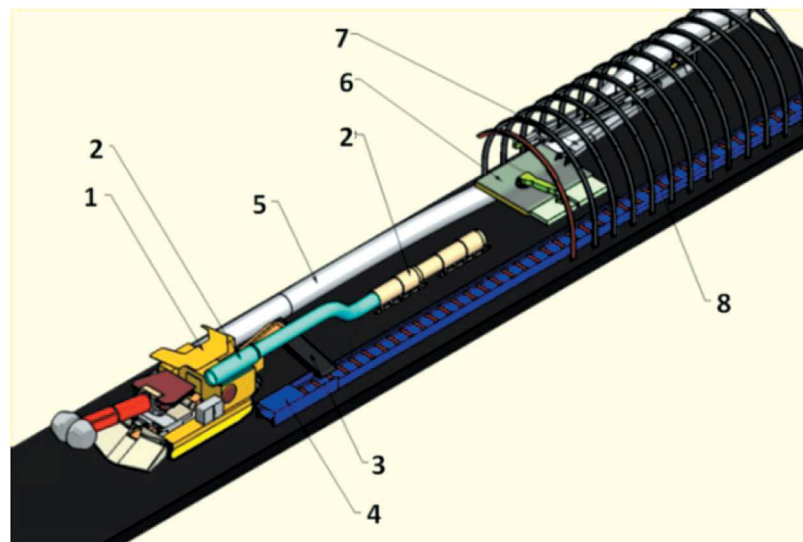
Model of collaboration of mechanized temporary roadway support with roadheader: 1 – roadheader, 2 – dust precipitator, 3 – bridge conveyor, 4 – chain conveyor, 5 – ventilation pipe, 6 – working platform, 7 – manipulator, 8 – steel arc lining LP
